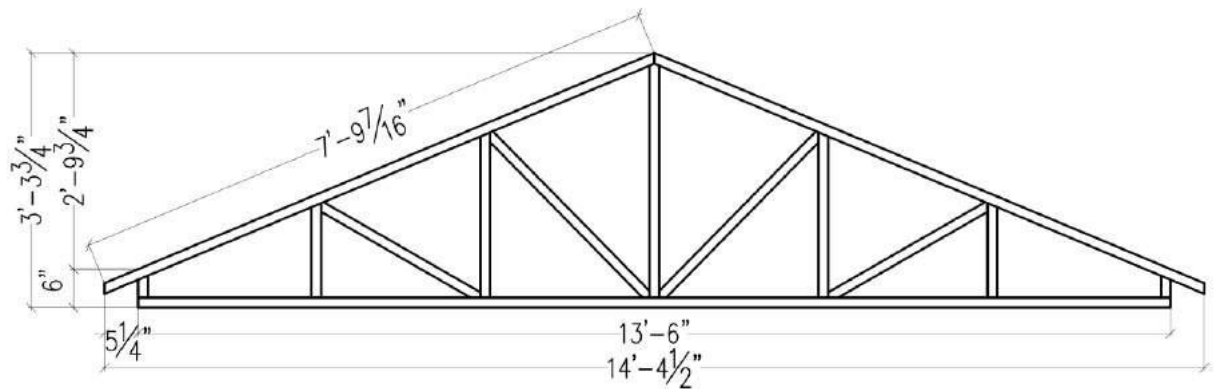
and Figure D-14 show the design and dimensions of the two truss types used in the testing structure. Truss design T1 has a heel height of 6.5" and will be used in Designs 1 and 2, the Base case and the adjoining buffer bay. Truss design T2 has a lower heel height of 5.5" and will be used in the remaining two design bays and the end buffer zone.
